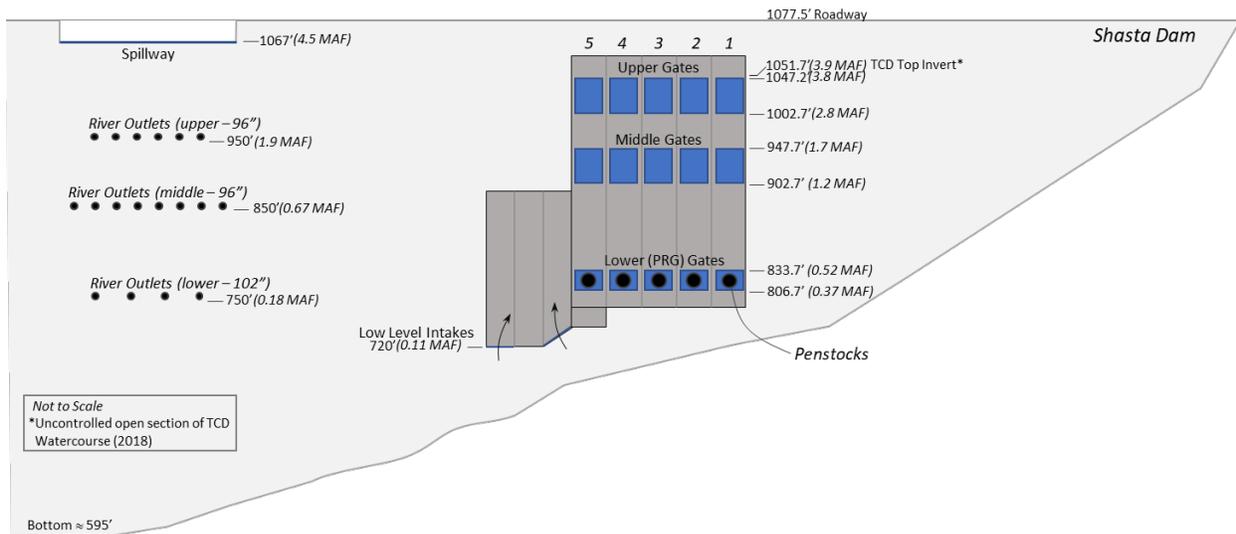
Shasta Dam outlet works and Temperature Control Device, view looking downstream at upstream face of dam. Powerhouse units 1 through 5 are shown for reference.
